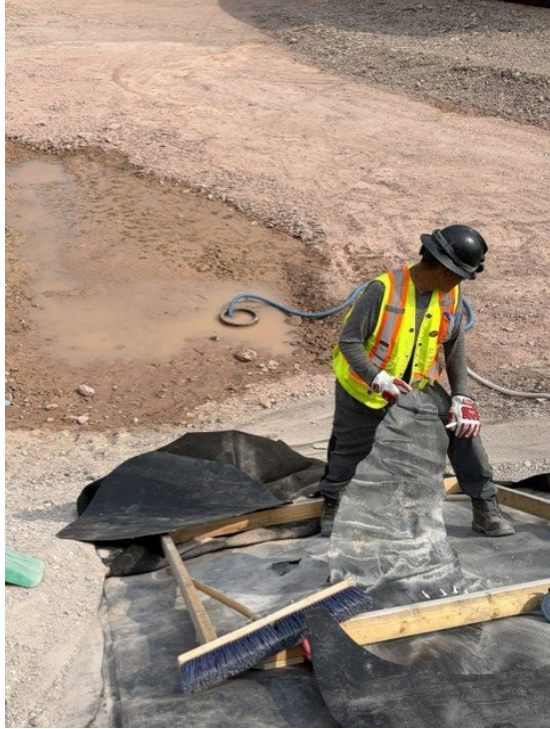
Damaged Liner NW Corner of Tank Farm 1
